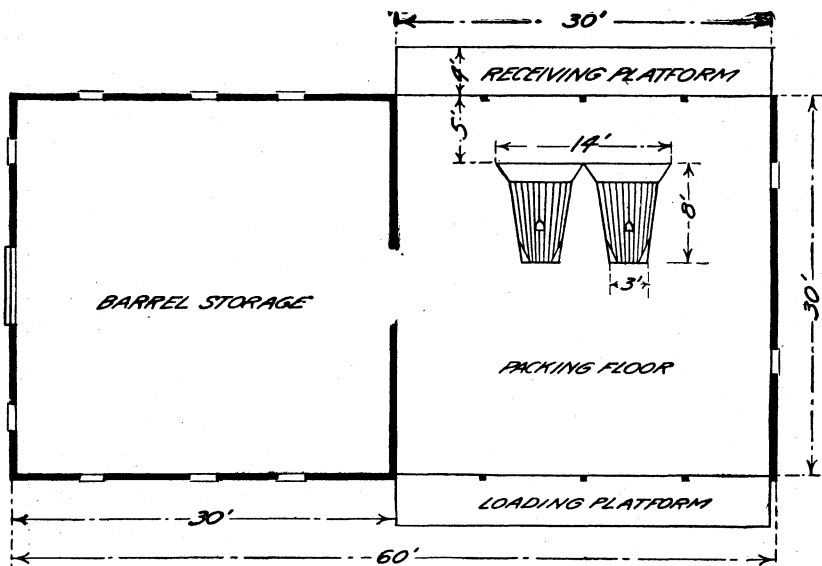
Plan 1: Floor plan of a packing house designed for packing by hand
